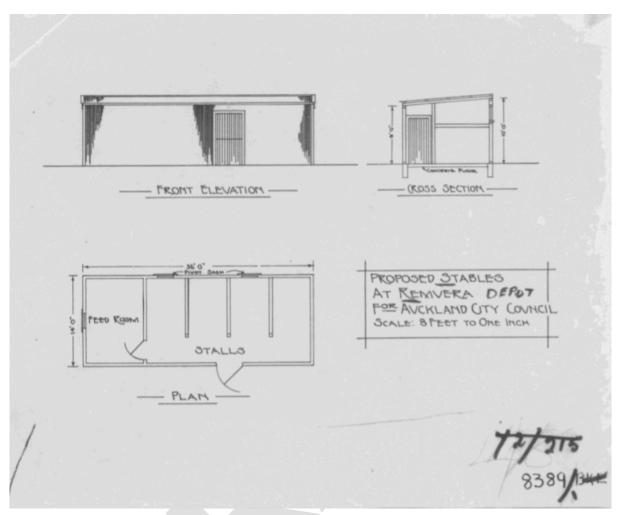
Undated drawing showing proposed stables at the Remuera Depot for Auckland City Council. It is unlikely that this stable is one of the existing buildings, but added, possibly temporarily, to accommodate stables (AKC 033 City Engineers Works Plans Aperture Cards 1872-1993, Plans 7100-8999, Auckland Council Archives).
